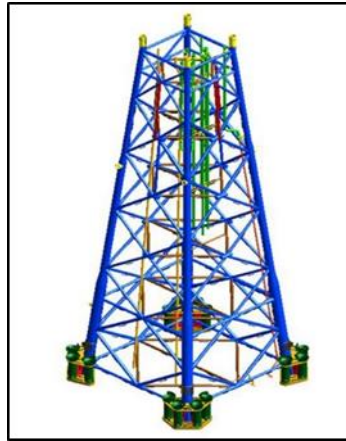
Fixed Platform Type - Piled Steel Jacket
